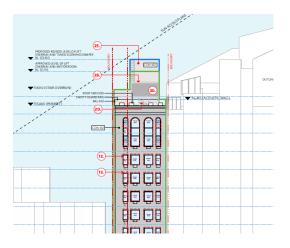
east elevation plan extract, showing all works increasing the height of the building to be below the Belmore Park sun access plane
